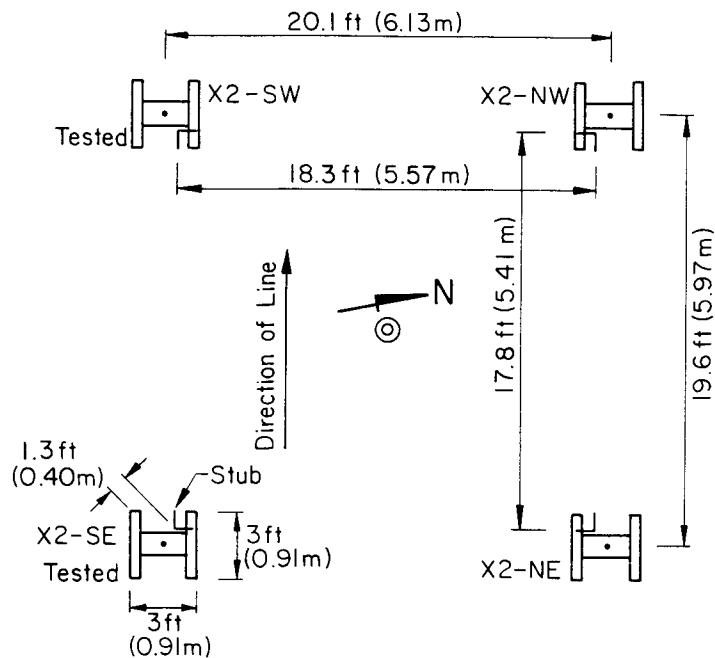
Plan View of Wyncoop Creek X-Tower (Lehigh) Grillages
